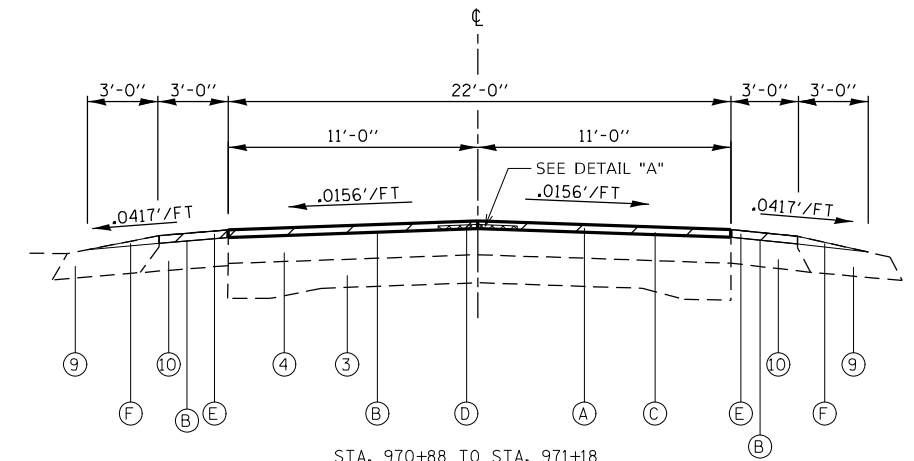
DETAIL "A" SHALL BE APPLIED ALONG THE LANE JOINTS OF PAVEMENT
